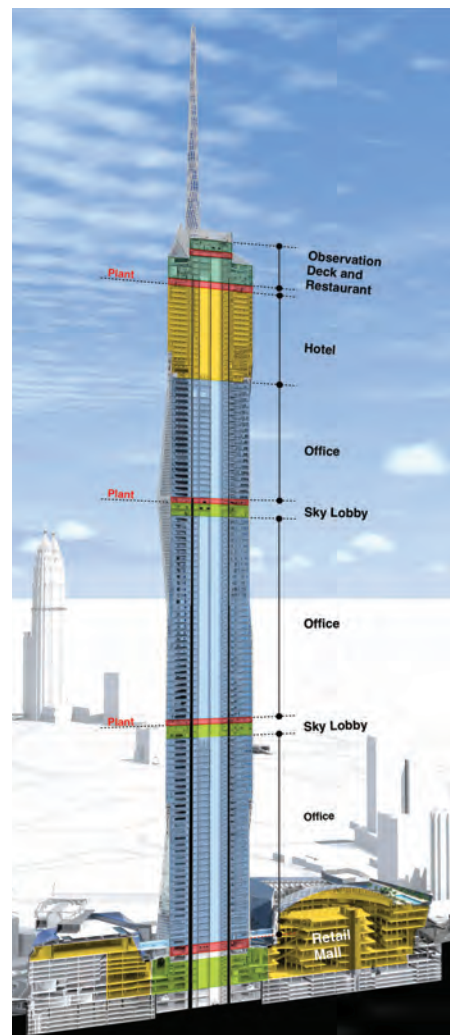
Tower Section (Source: PMV/Fender Katsalidis)
